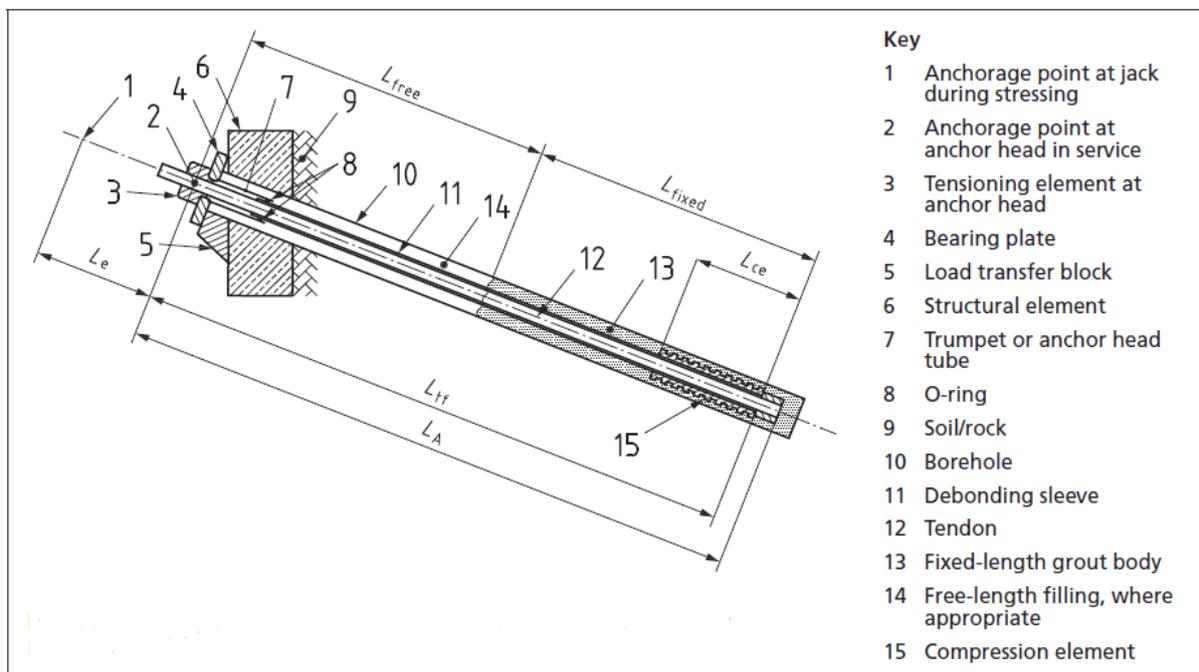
Schematic diagram of a grouted anchor, from BS 8081:2015. This diagram shows a compression-type grouted anchor; details of anchor head and head protection are omitted.
